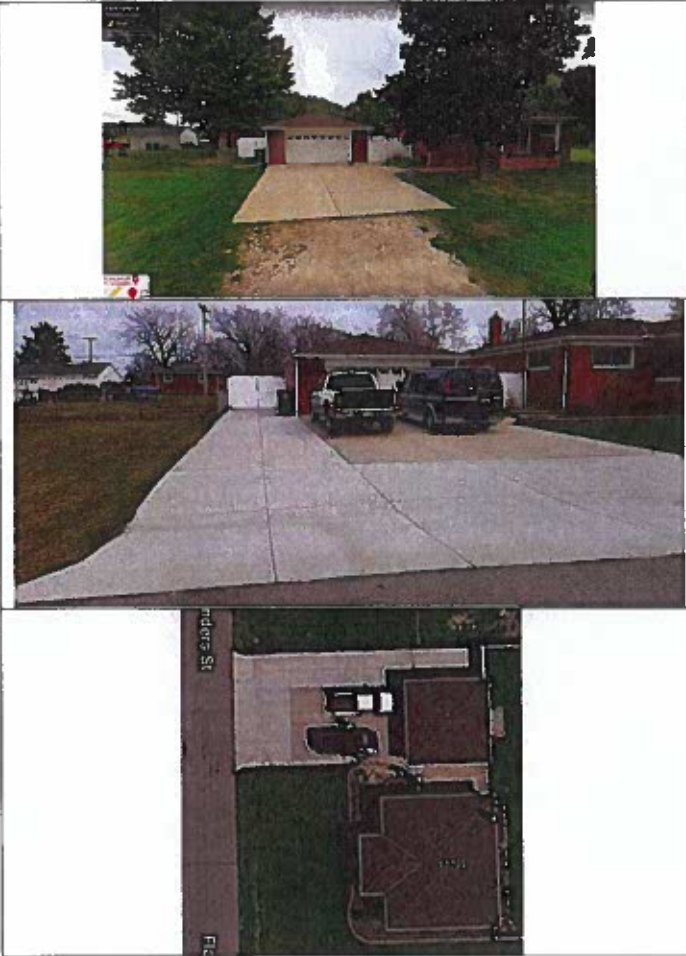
BZA Appeal PR22-007 Revision 12/21/2022
